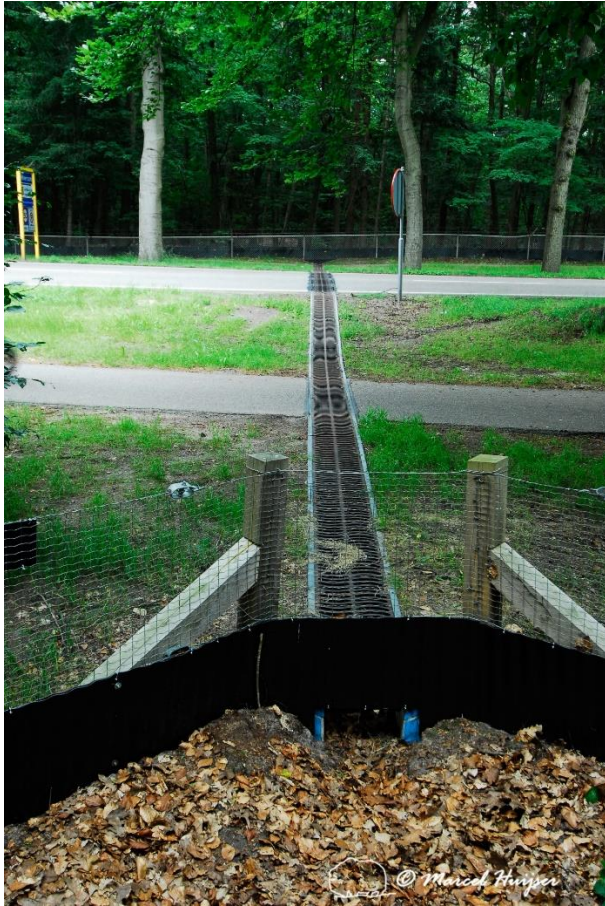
Barrier wall and underpass with slotted roof for common toads, The Netherlands.
